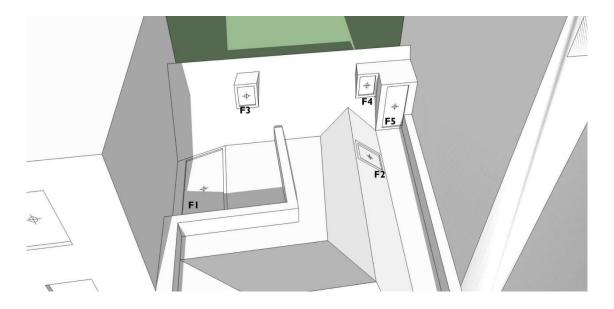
Existing Windows on top floor flat (Block F) No. 160 Finchley Road
